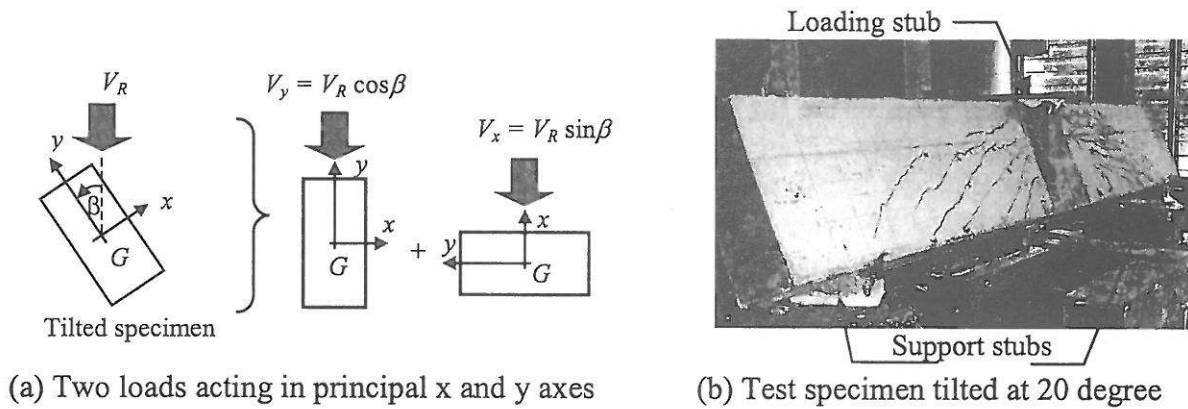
Bi-axial loading test with one hydraulic jack providing load in vertical direction
